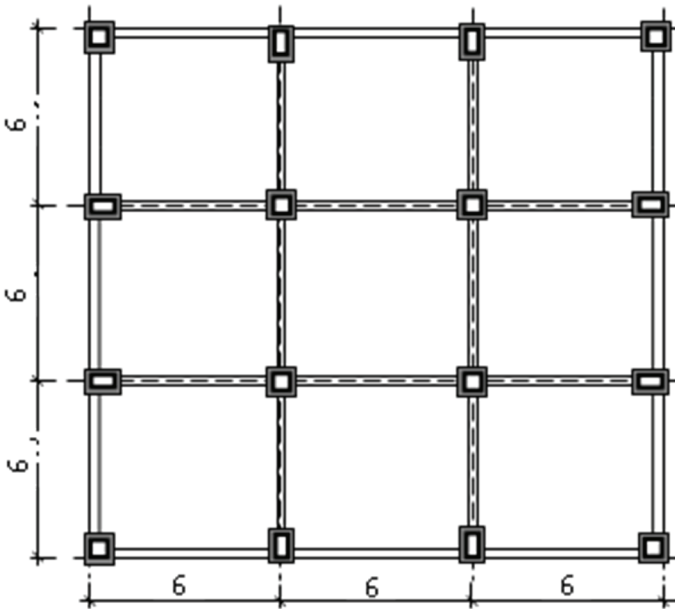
Typical Floor Plan of the Sample Building (Retrofitted with Column Jacketing)
